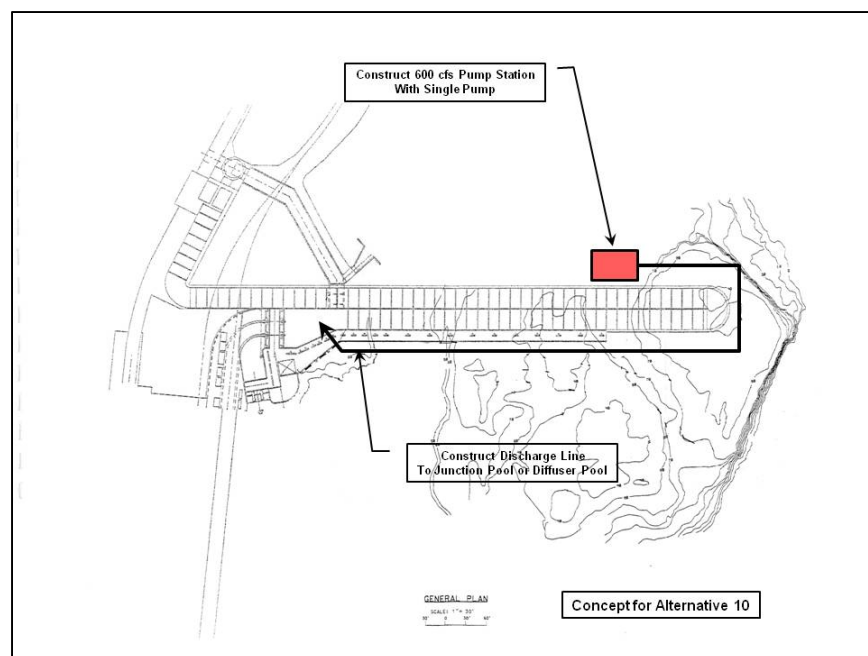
Concept for Alternative 10, Single Pump/Pumphouse on East Side
